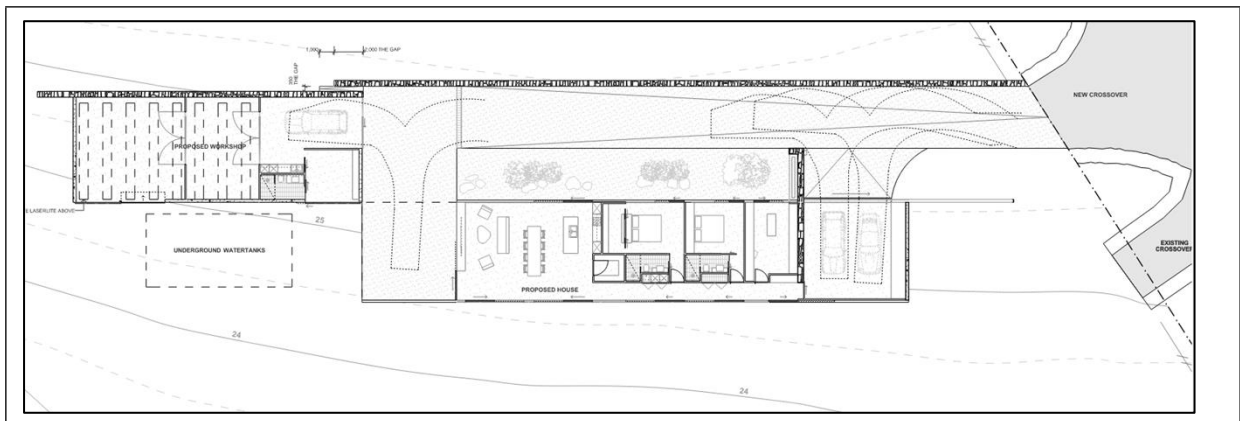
Proposal Plans – Site and Floor Plan - Dwelling
